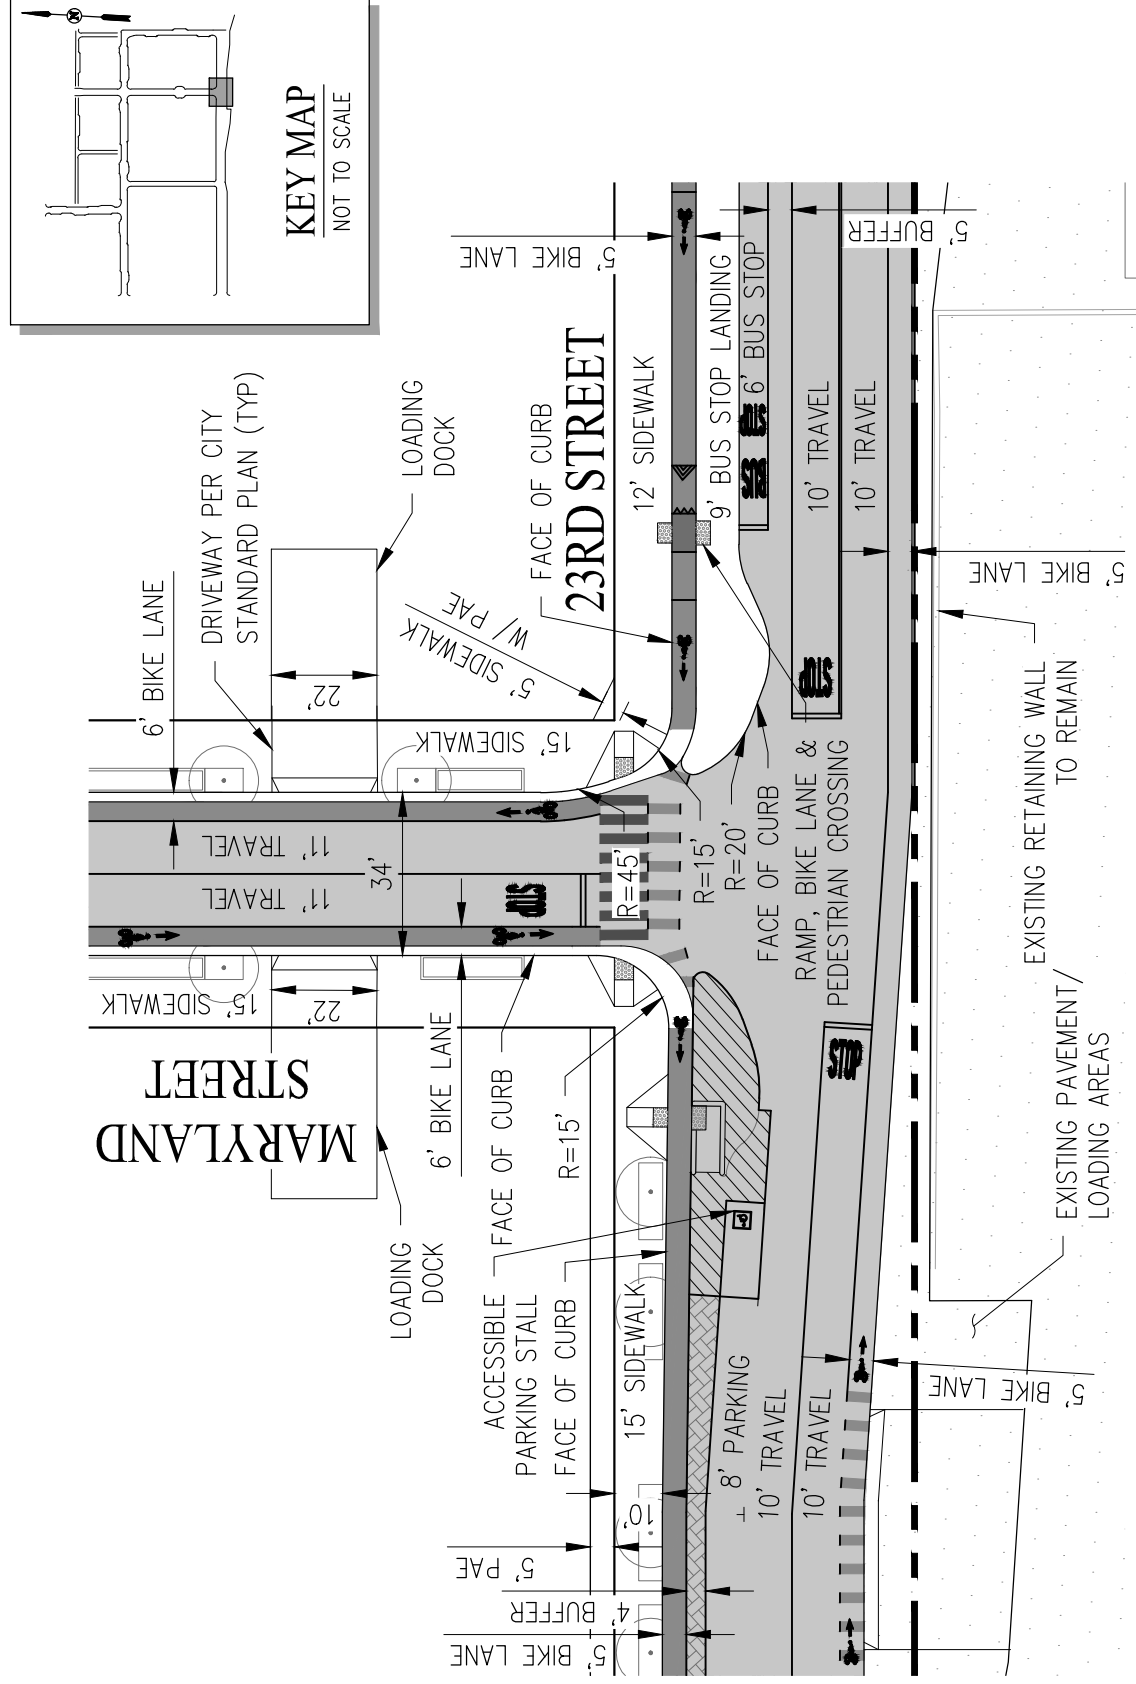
MARYLAND STREET AND 23RD STREET
